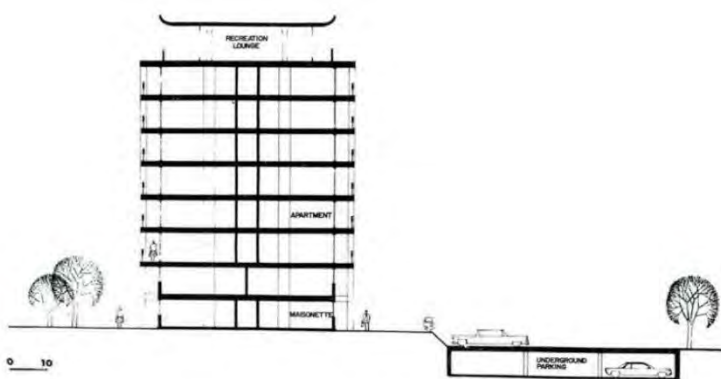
East-west section through 1 Deauville Lane showing general construction details (Source: Grossman 1961:62).
